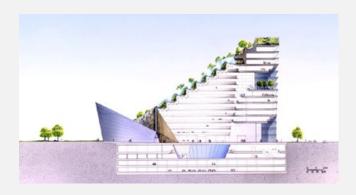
Design of building in Fukuoka, Japan is an example of the use of under-utilized space as a park or open space (image credit: Greenroofs.com)
